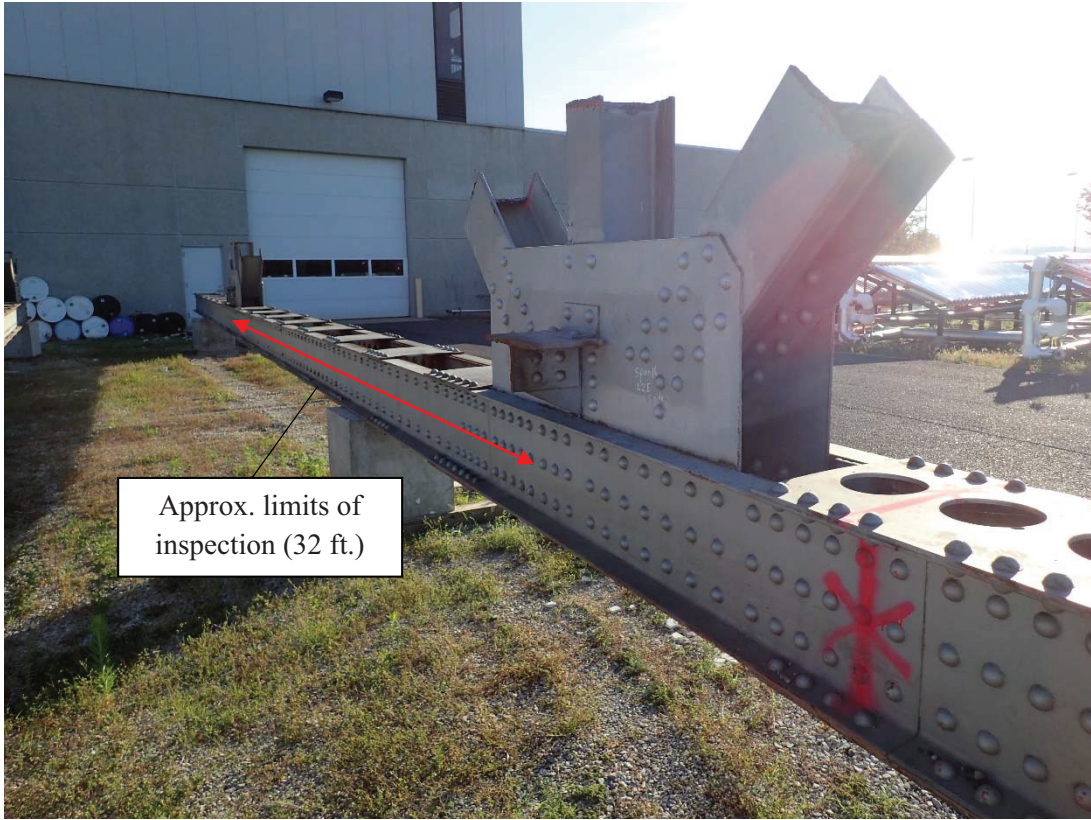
Truss chord elevation view (looking from joint L4 toward joint L2)
